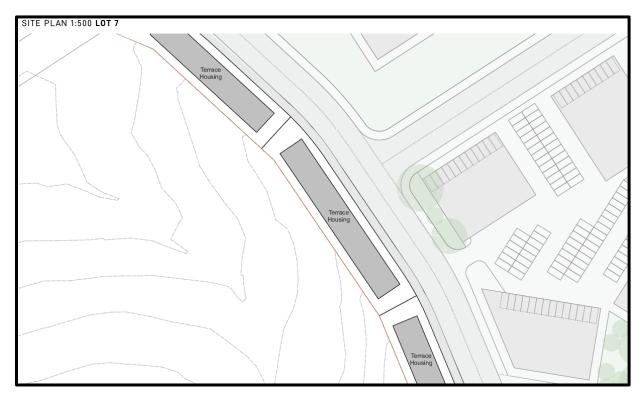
Part of Lot 7 of the Mixed–Use Precincts Site Plan (Source: Robert Harwood Architects)
